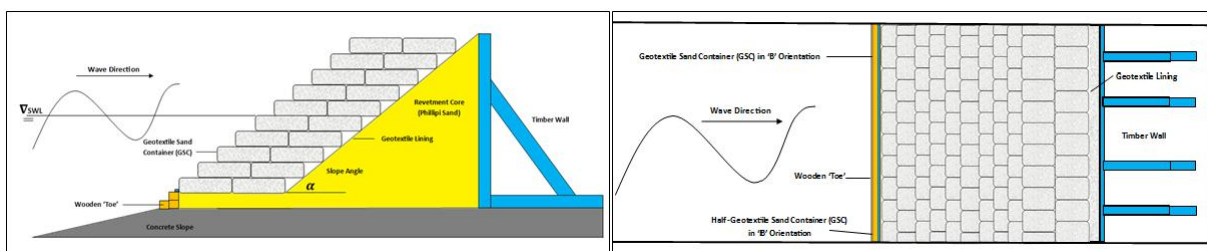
Schematic Cross-section (Left) and Plan View (Right) of GSC Revetment for Test Series 4
